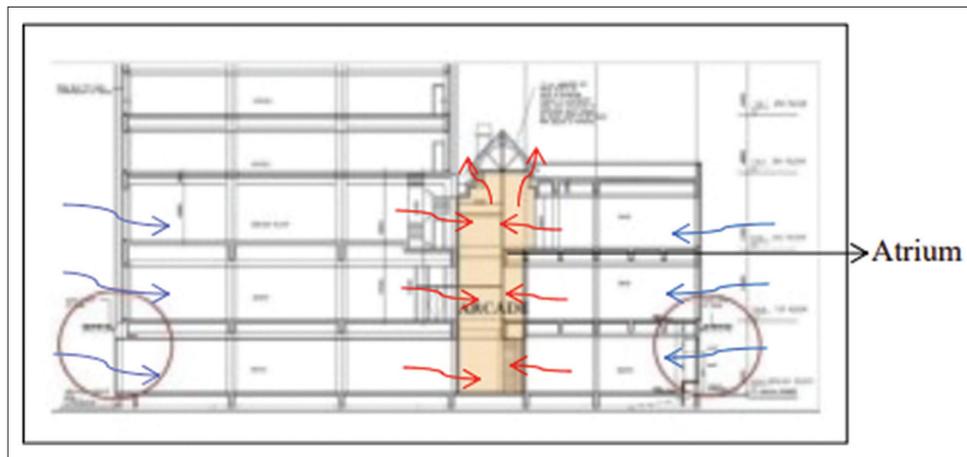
Section through I&M building showing a central atrium used to promote stack-driven air movement
